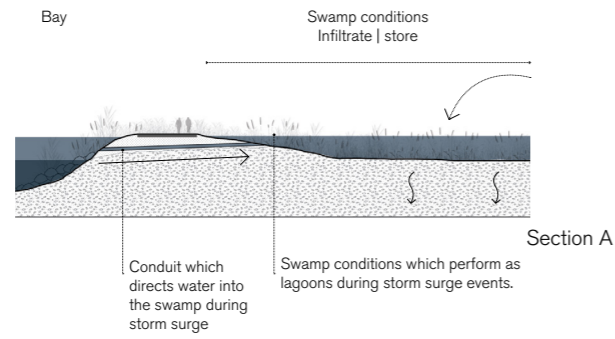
Section upstream to downstream, Technical details. Illustration : Author
